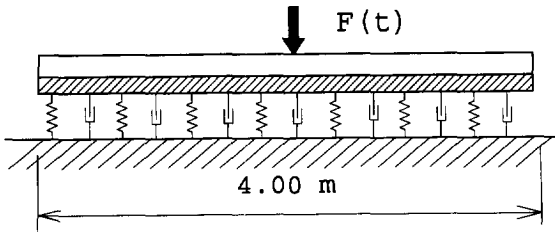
Model of concrete pavement with Winkler springs and silent bed
